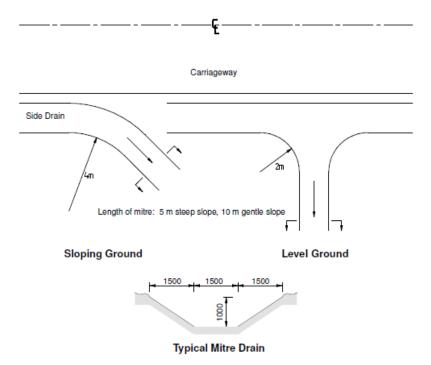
1 Typical Stormwater Mitre Drain / Channel
